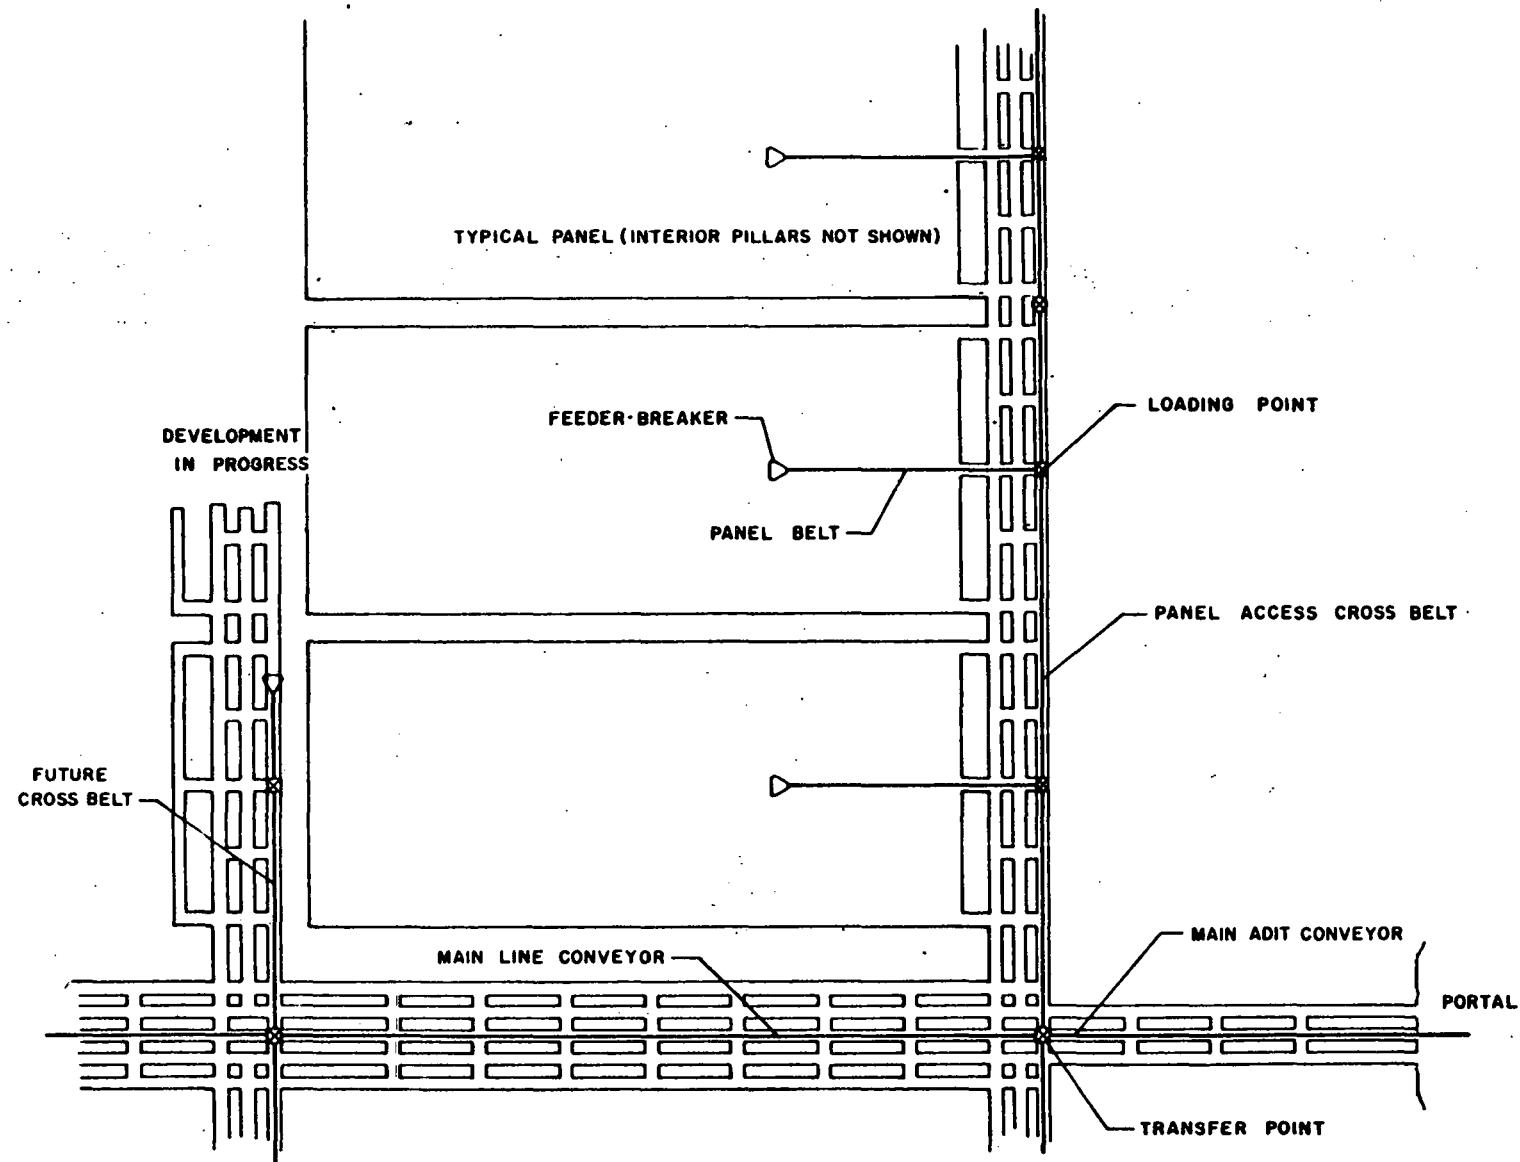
TYPICAL CONVEYOR LAYOUT
